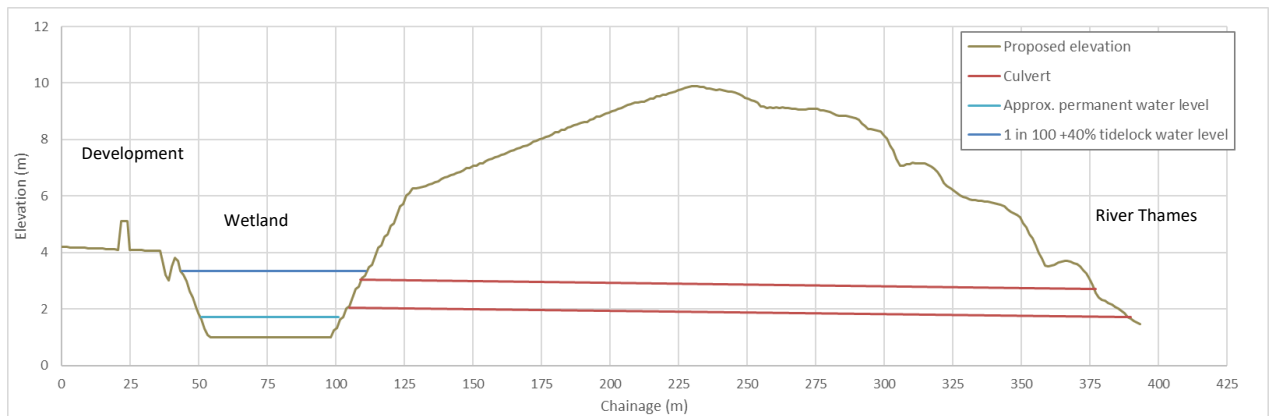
Long section through edge of development, new constructed wetland and new culvert and outfall
